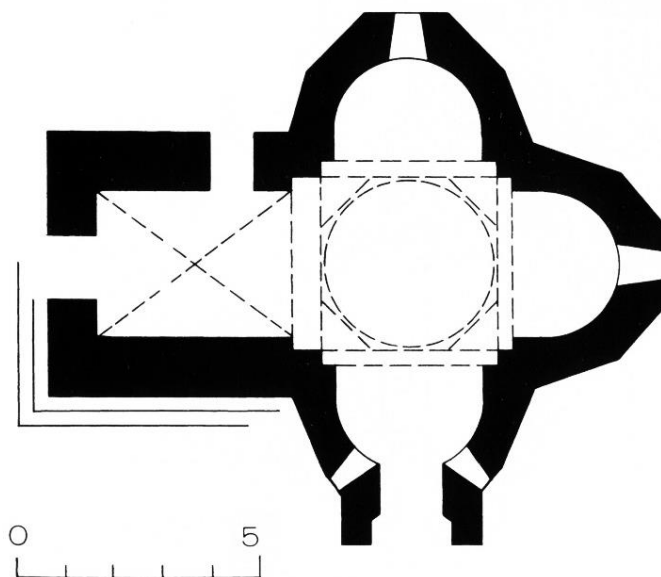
Alaman, St Ananias chapel, 637, plan © M. Asratjan 2000, p. 130
